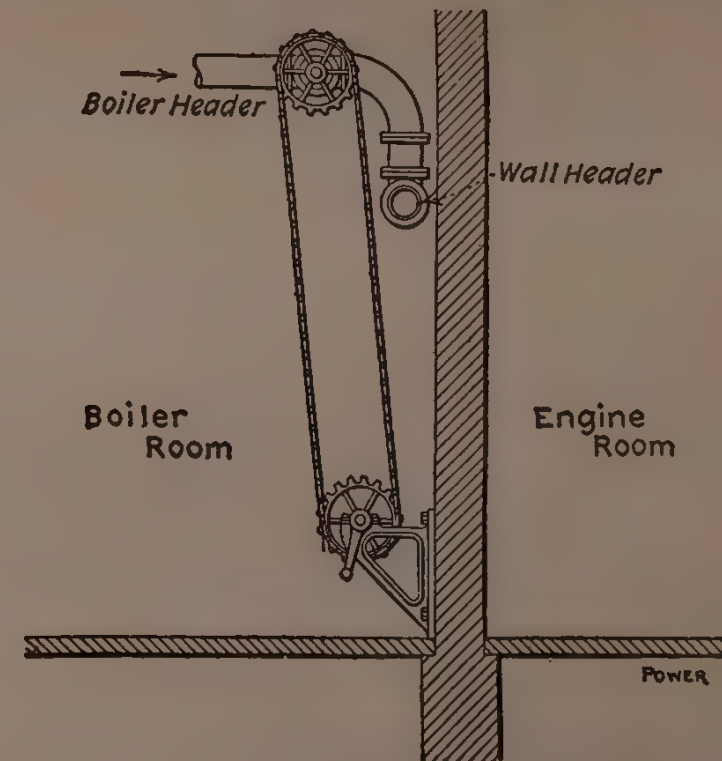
DEVICE FOR OPERATING MAIN STEAM VALVE
